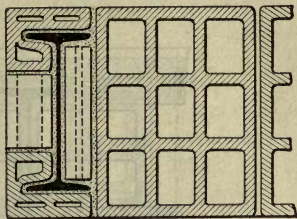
Single I-Beam Girder Protection at Well-room.
